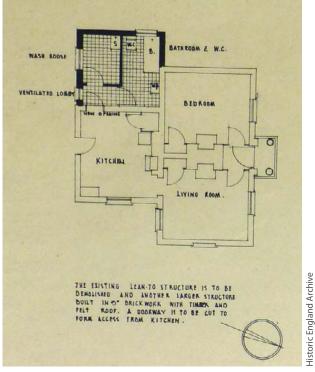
LCC plan of the White Lodge following an extension for a bathroom in the south-west corner
